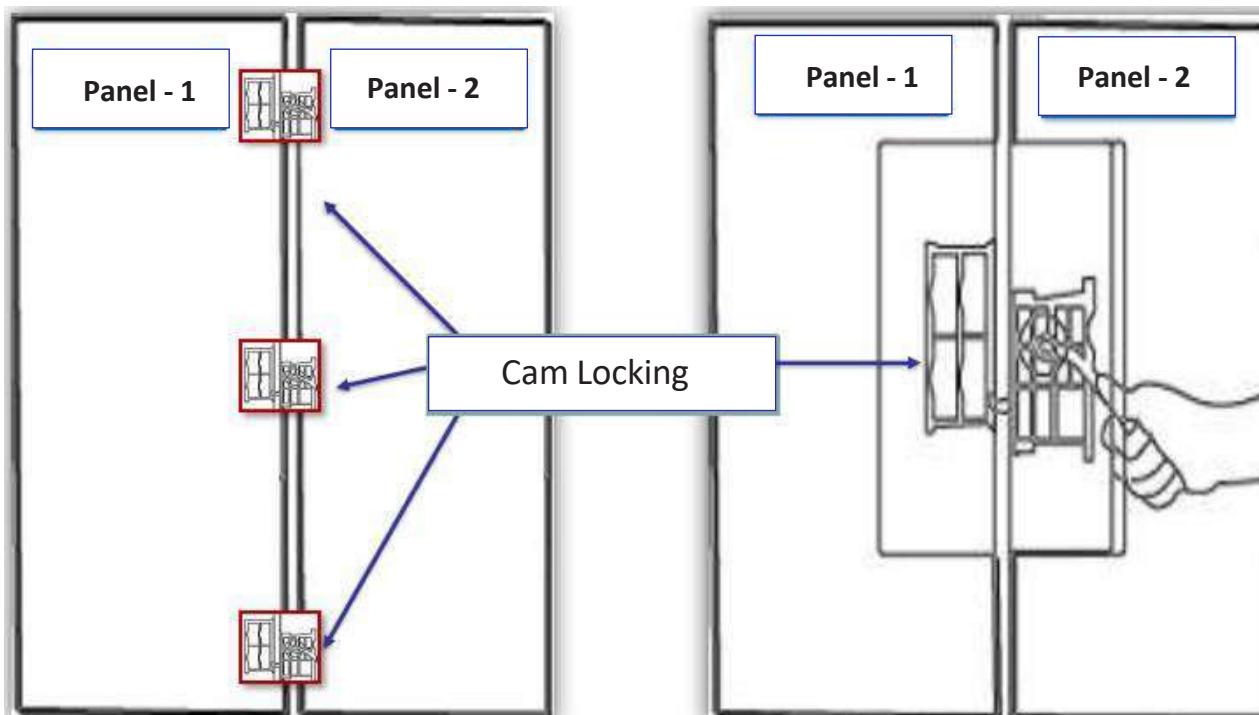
(ii) Interlocking Mechanism of PUF Panels: CAM locks
